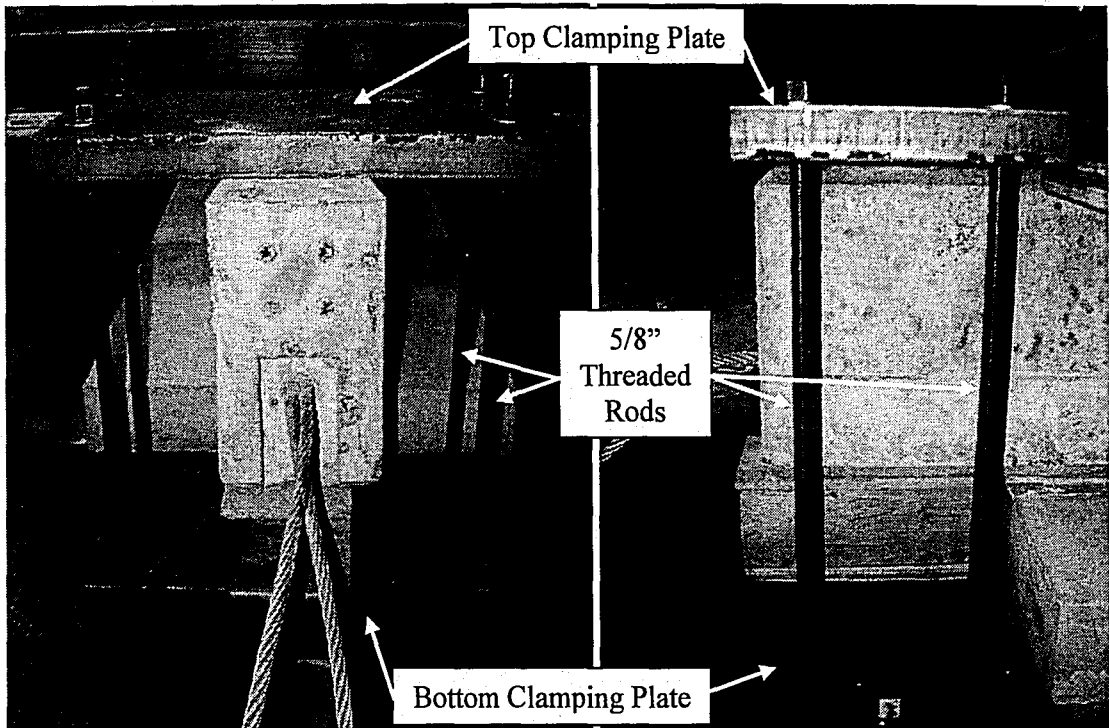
Side and Elevation View of the Clamping Plate Setup
